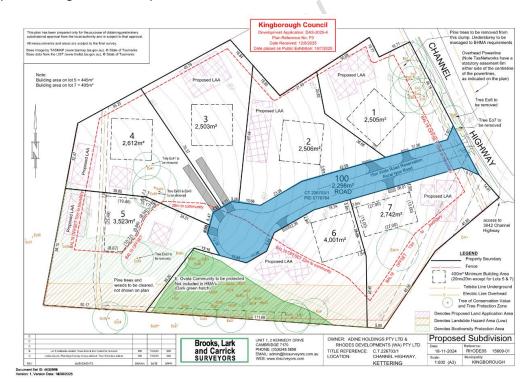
Extract from advertised plans showing proposed 'Harbour View Rise' in blue
